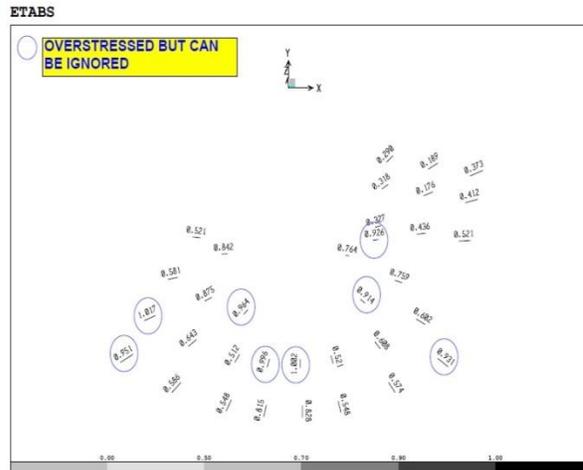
Demand/ Capacity Ratio of 1st Floor Columns after Retrofitting
